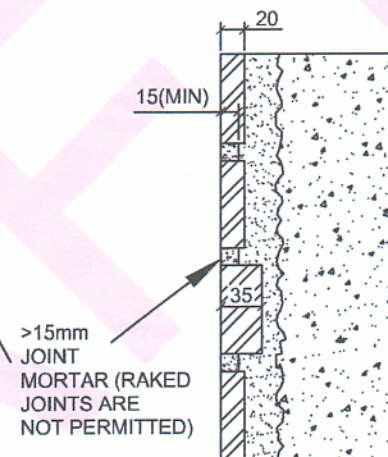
Typical section through the Fortress Walling – Concrete Panel
